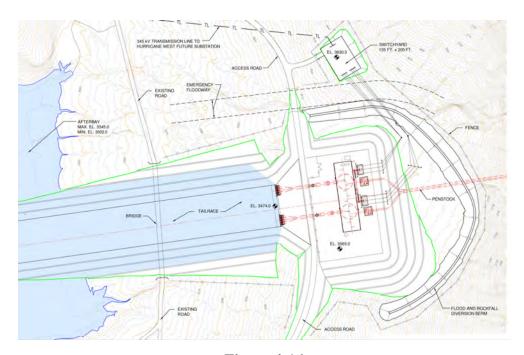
Site Plan for Hurricane Cliffs Pumped Storage Powerhouse
